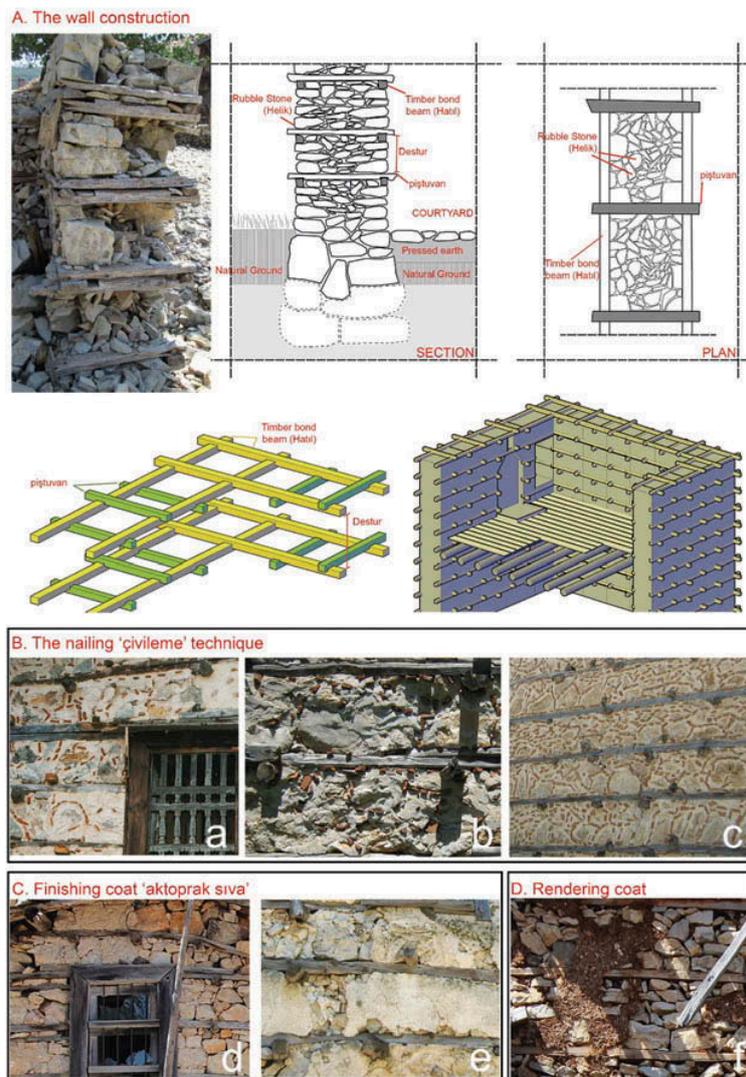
(A) 3D model and details of the wall construction used in the Bucakalan village; (B) examples of: (a,b,c) the nailing “çivileme” technique, (C) finishing coat “aktoprak siva” (d,e), and (D) rendering coat (f), from the Bucakalan village.
